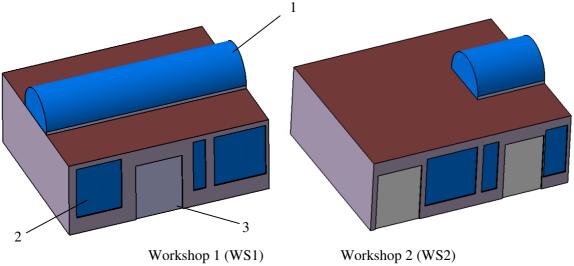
3D simplifiedsketches of experimental workshops: 1 – roof window; 2 – wall window; 3 – garage door
